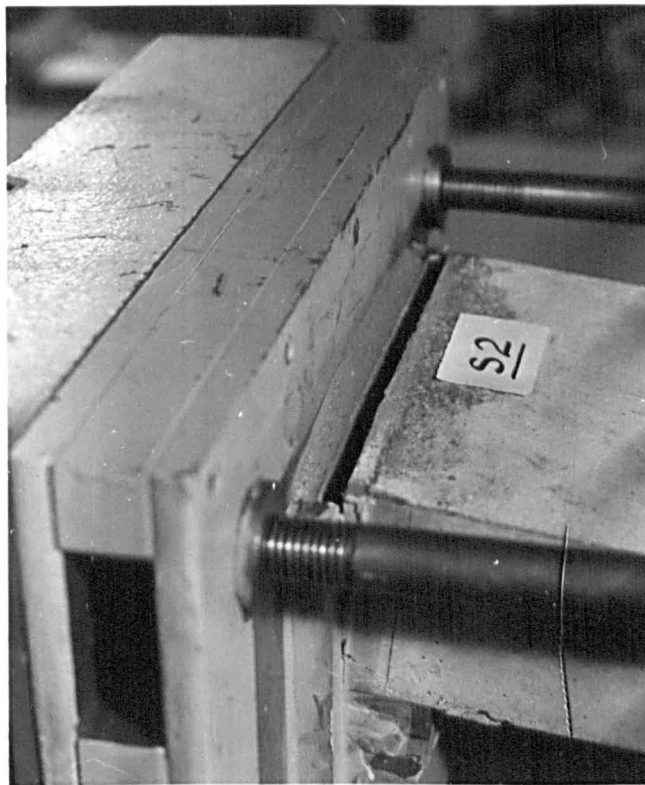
End of Slab Strip S2 Showing Failure of the Slab Concrete Without Failure of the Cement Mortar
